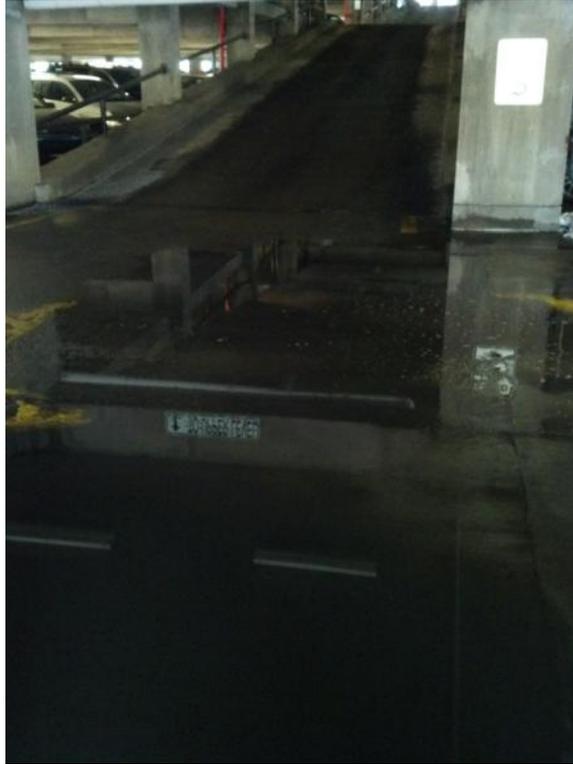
Standing puddle at bottom of down ramp on 2<sup>nd</sup> floor
